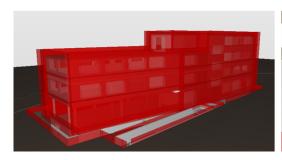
Use Case »Fall protection (Absturzsicherung)« – side protection on a construction site
